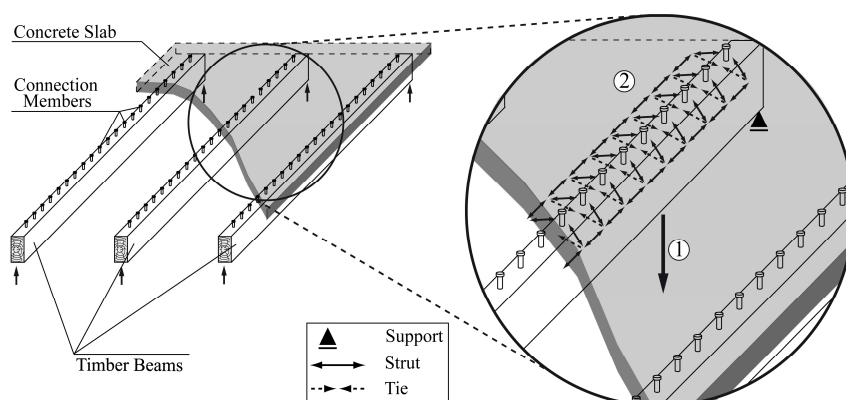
Principle structure of a TCC ceiling with loading of the concrete slab
